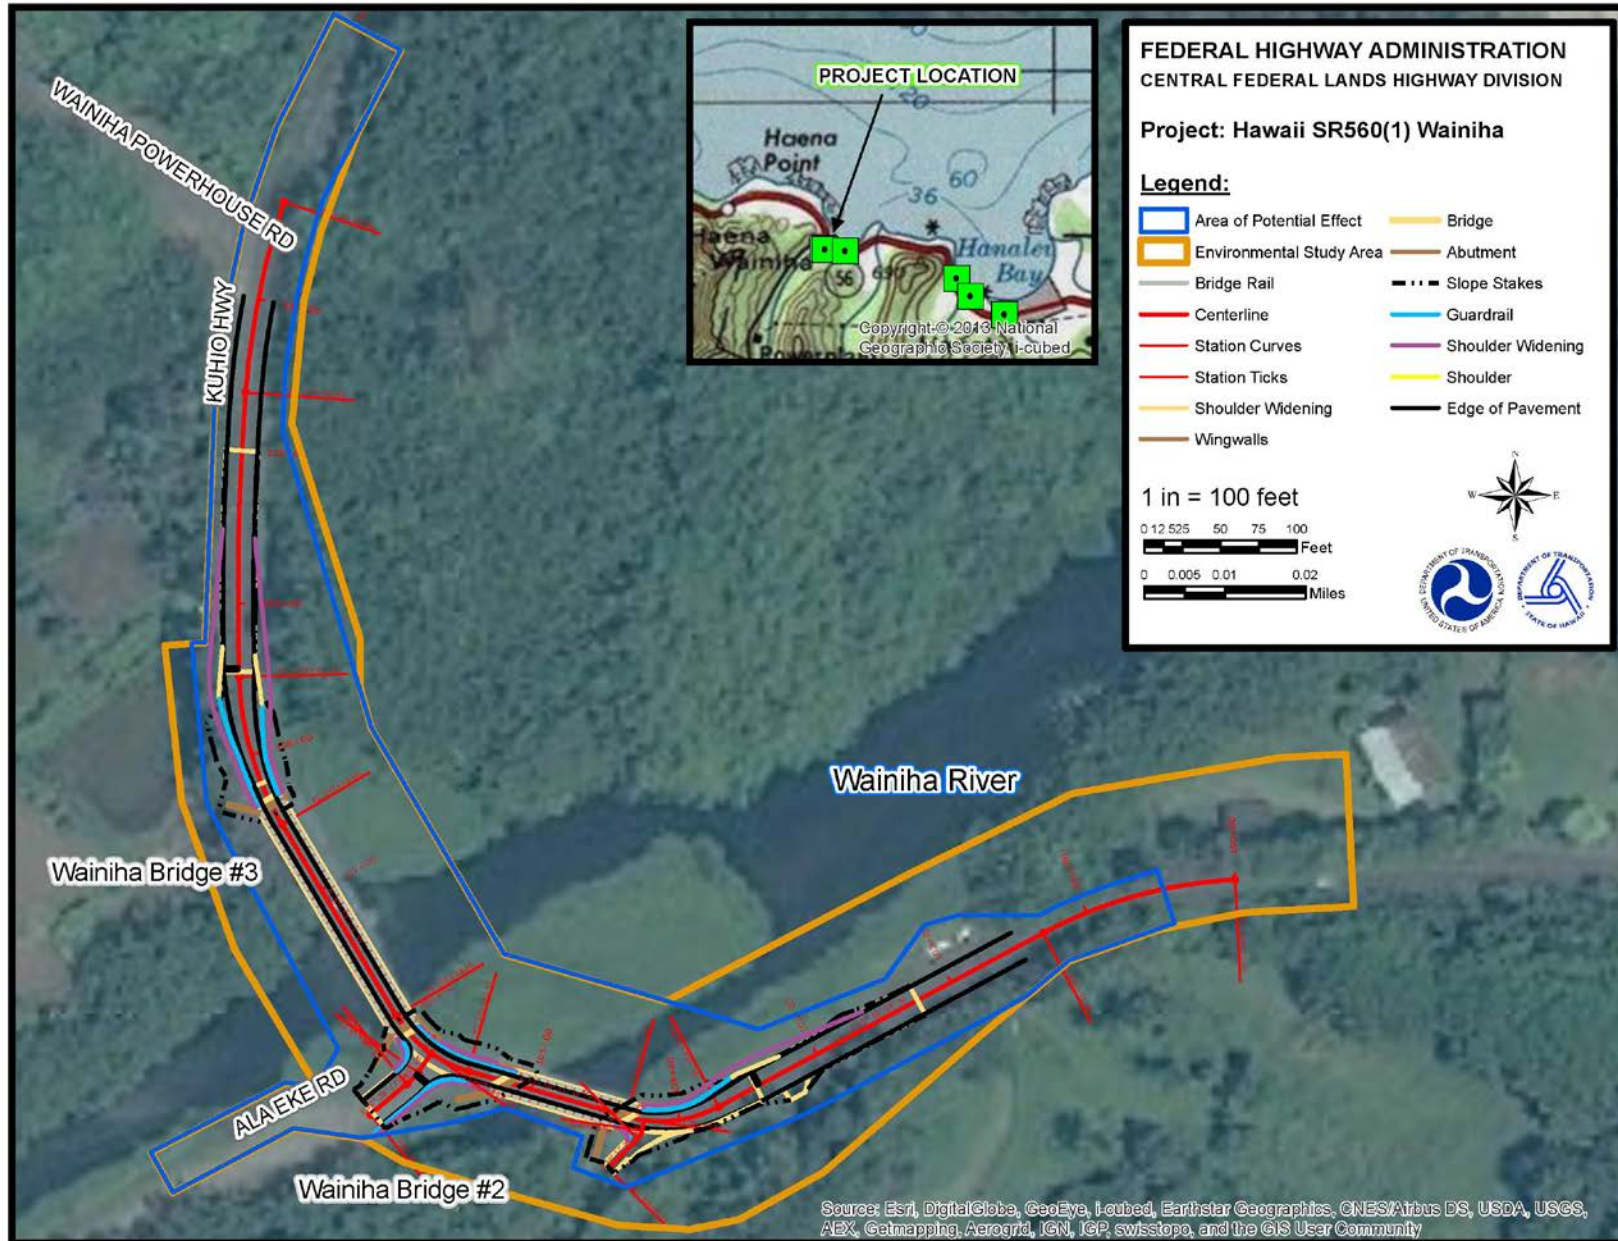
Proposed Preliminary Design at Bridges 2 and 3
